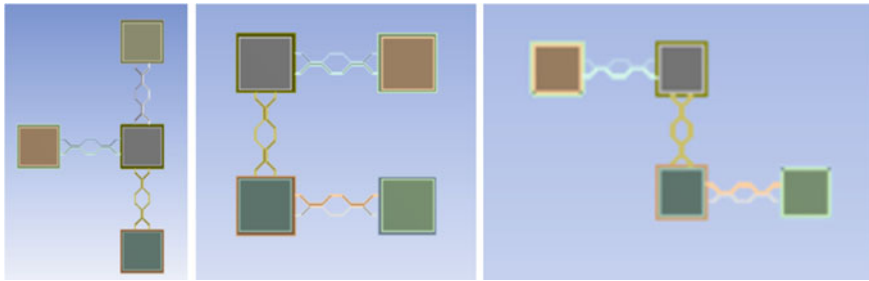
Top view of T-shape, C-shape and Z-shaped CFST columns connected with corrugated plate
